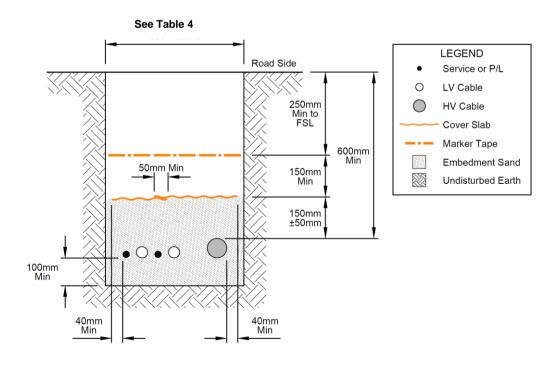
Typical Trench Section - 600mm Minimum Cable Burial Depth (1 HV, 2 LV, 2 Service or P/L shown)
